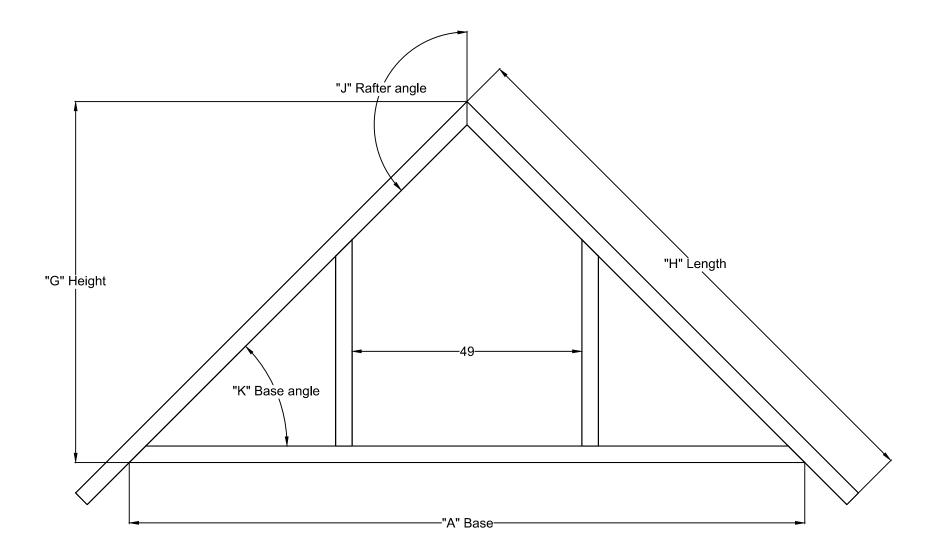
Detailed view of the framing for Gable Roof Shed Plans in 21 Sizes
